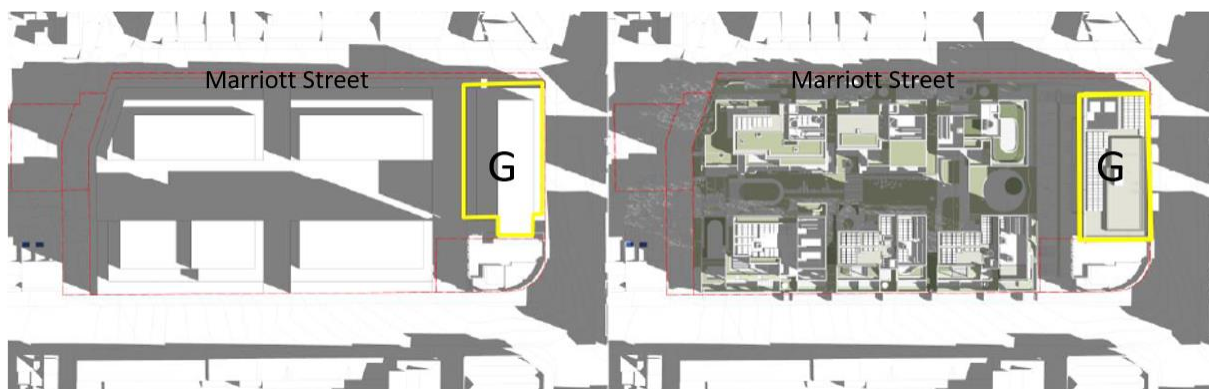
Building G DCP envelope (left) and Building G proposed (right) at 10:00am, winter solstice.
